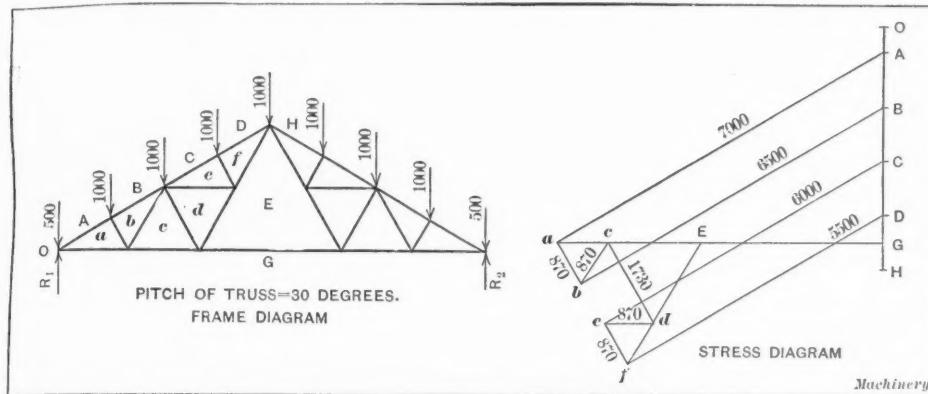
Frame and Stress Diagrams for Eight-panel Fink Roof Truss
